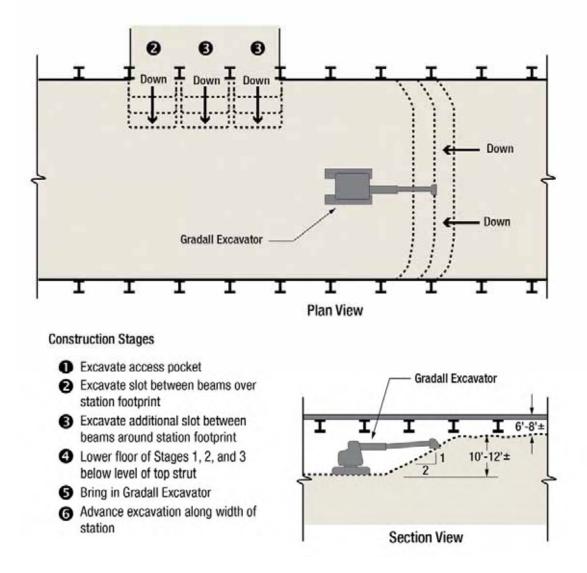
Plan Showing Excavation Procedure of Shallow Lifts with Low-Profile Gradall Excavator
